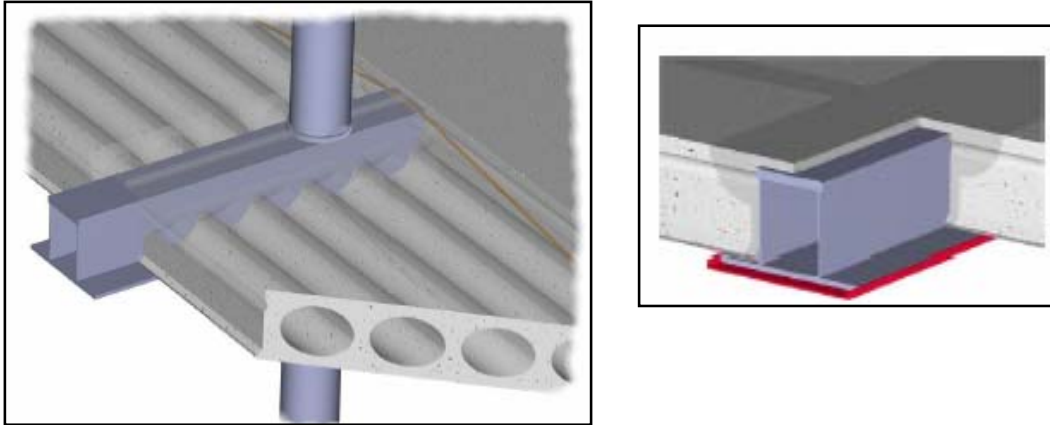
Hollow core connected to HSQ-beams inside the building and its fire resistance. [37]
